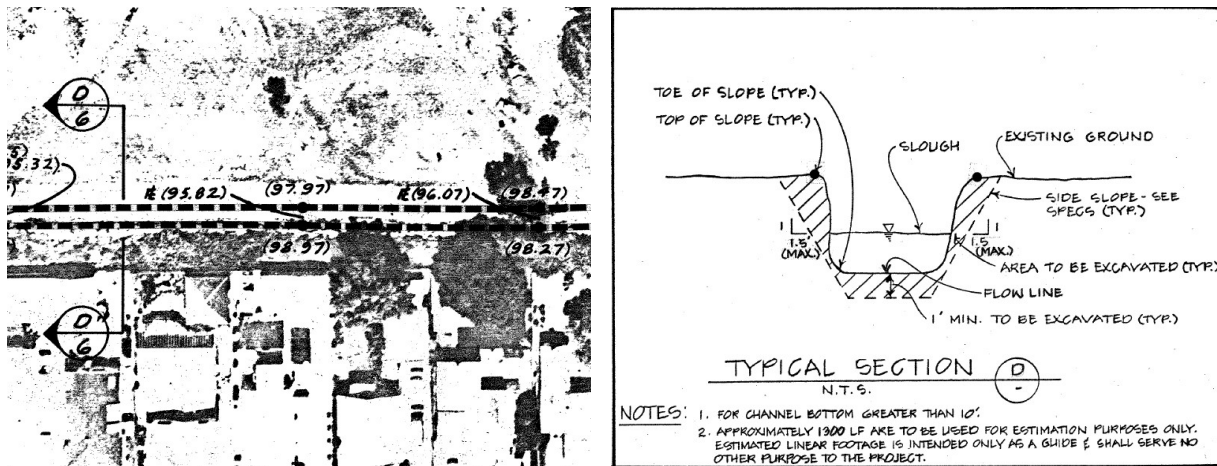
Typical West Slough Bankline and Flow Line Elevation Callouts (Left) and Dredging Detail (Right)
